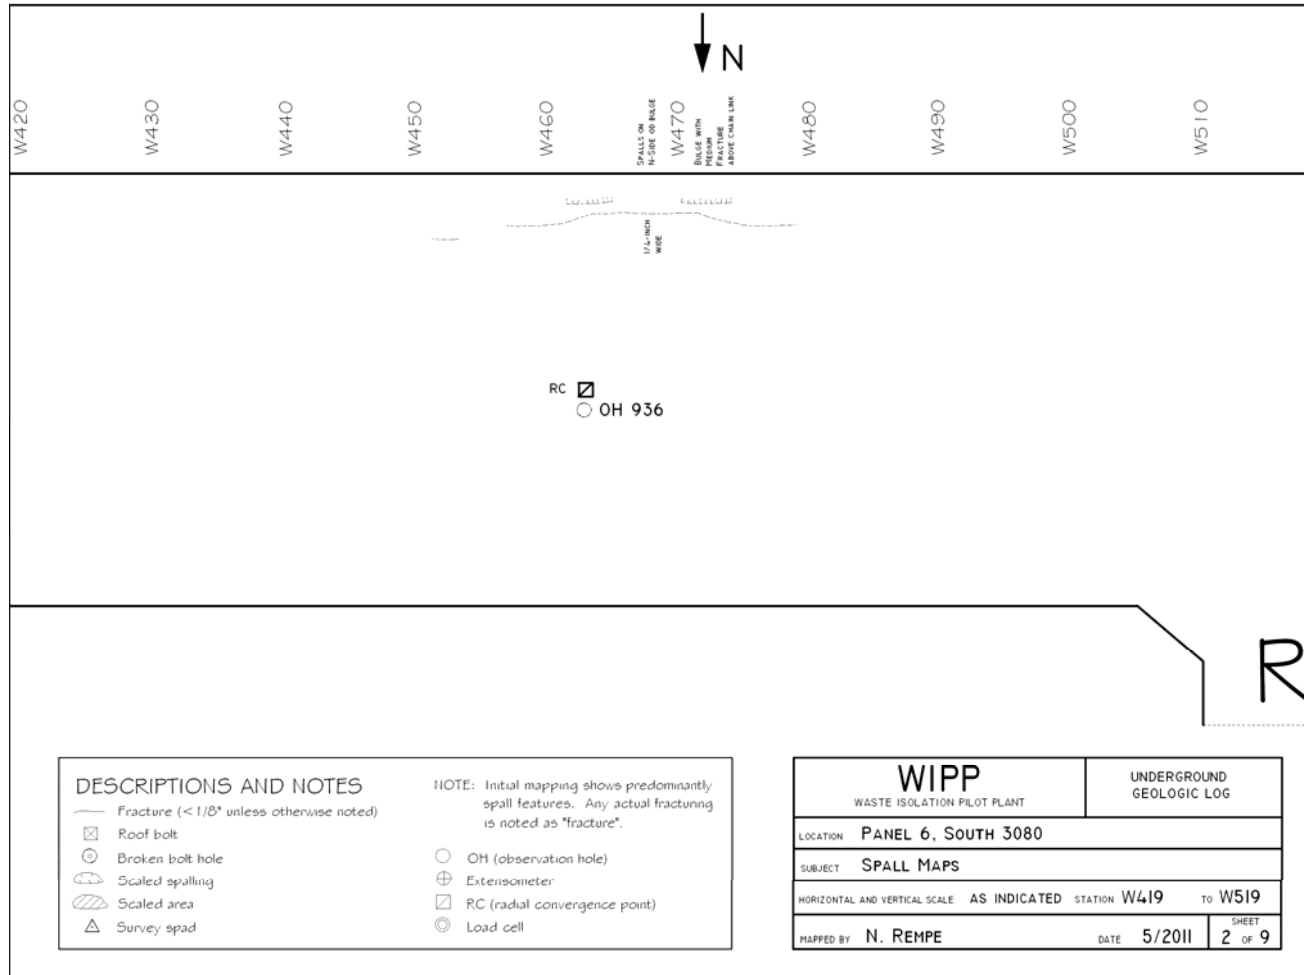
Panel 6 S3080, W390-W1210 Roof Fractures (Sheet 2 of 9)
